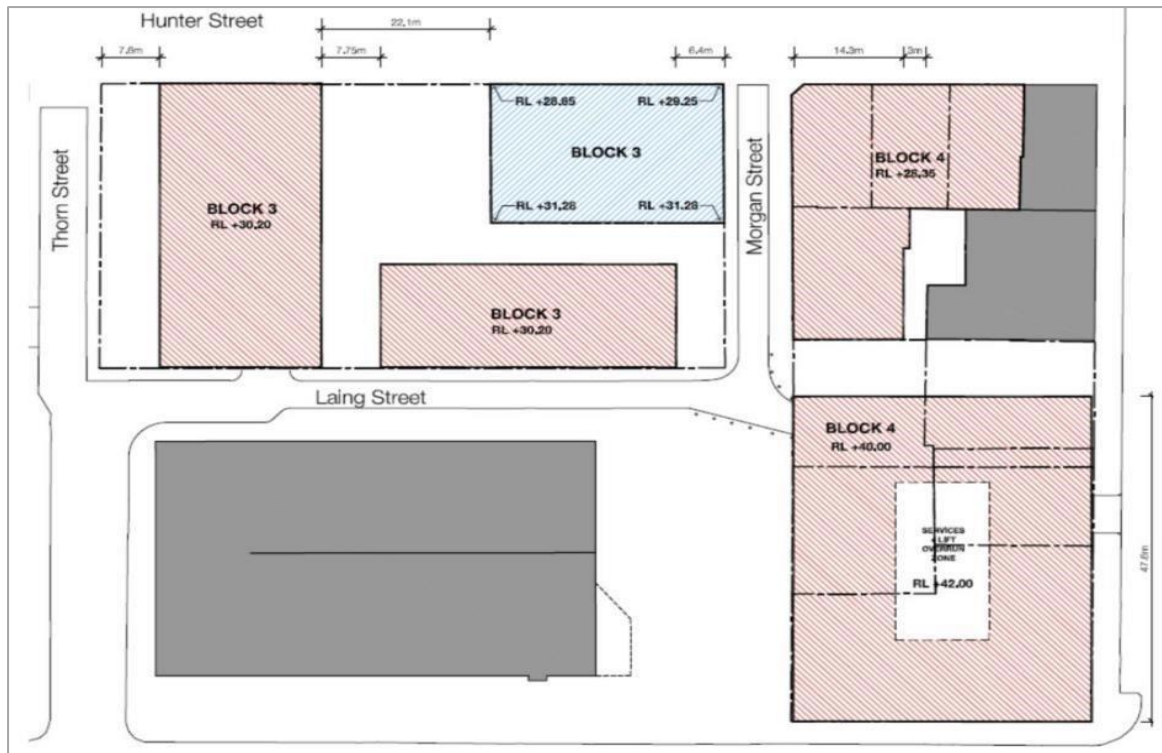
Approved Concept DA 'Envelope/height plan'. *Source: Urbis
